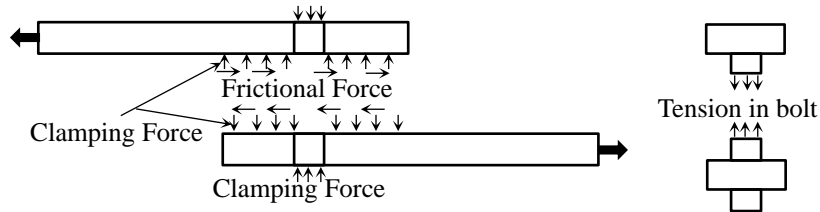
Load transfer mechanism of friction-type bolted connection
